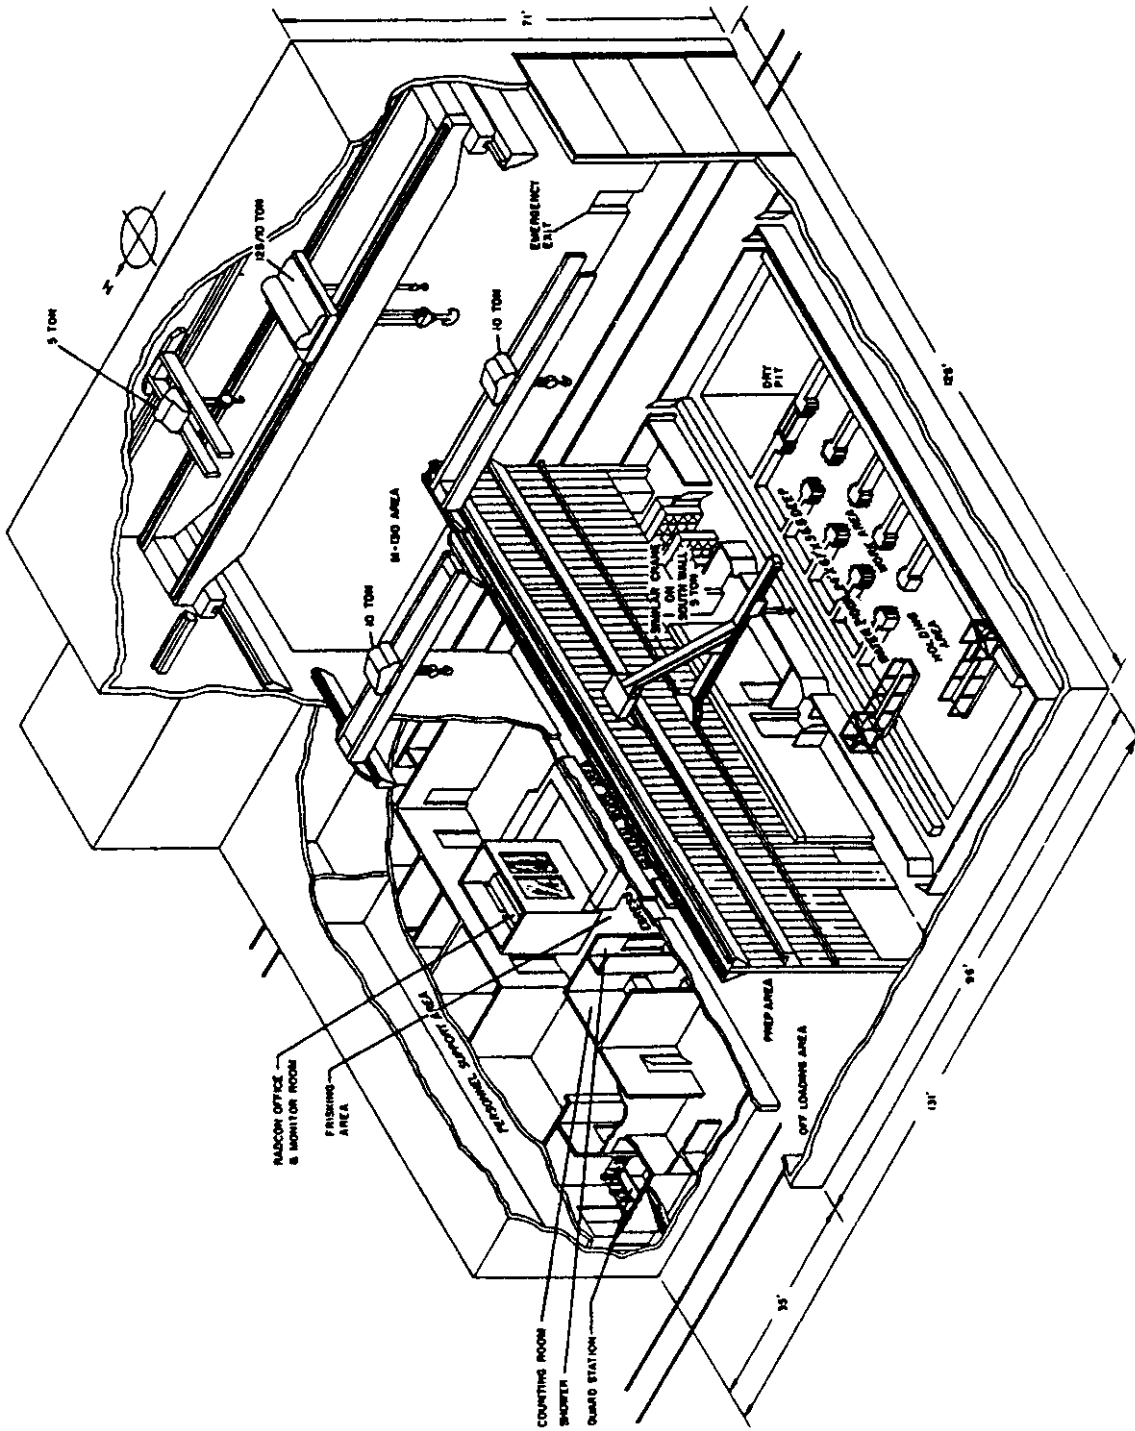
Puget Sound Naval Shipyard Water Pit Facility.
